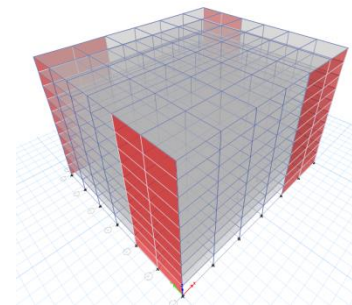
3D Plane of Model-02[SWP-01]
